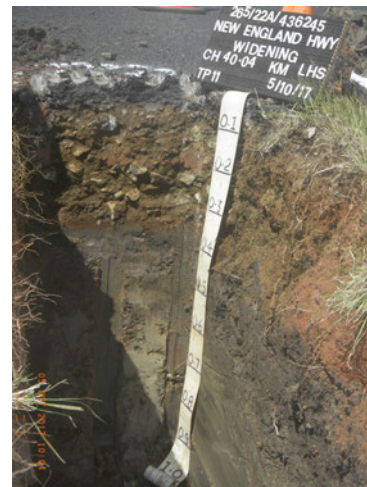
Wall face of the original test pit 11. (Department of Transport and Main Roads 2017, project documentation, 5 October)
